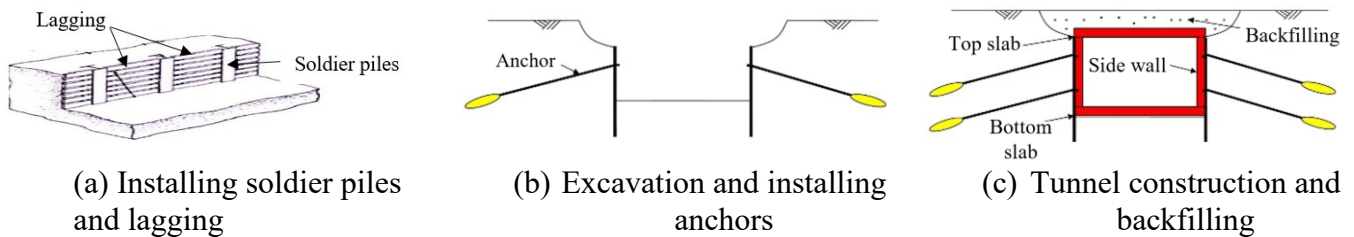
Construction process of C&C method using soldier piles and lagging (Abdallah and Marzouk, 2013)
